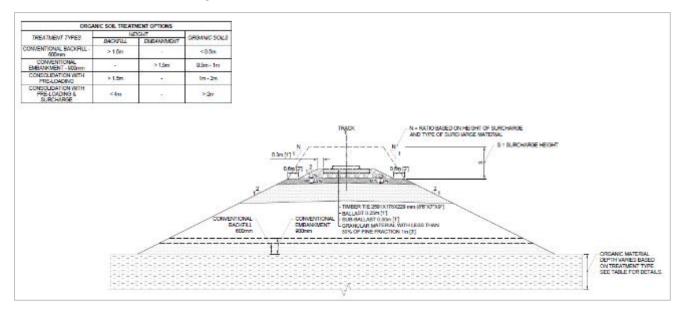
Typical Cross Section for Embankment Over Compressible Materials
